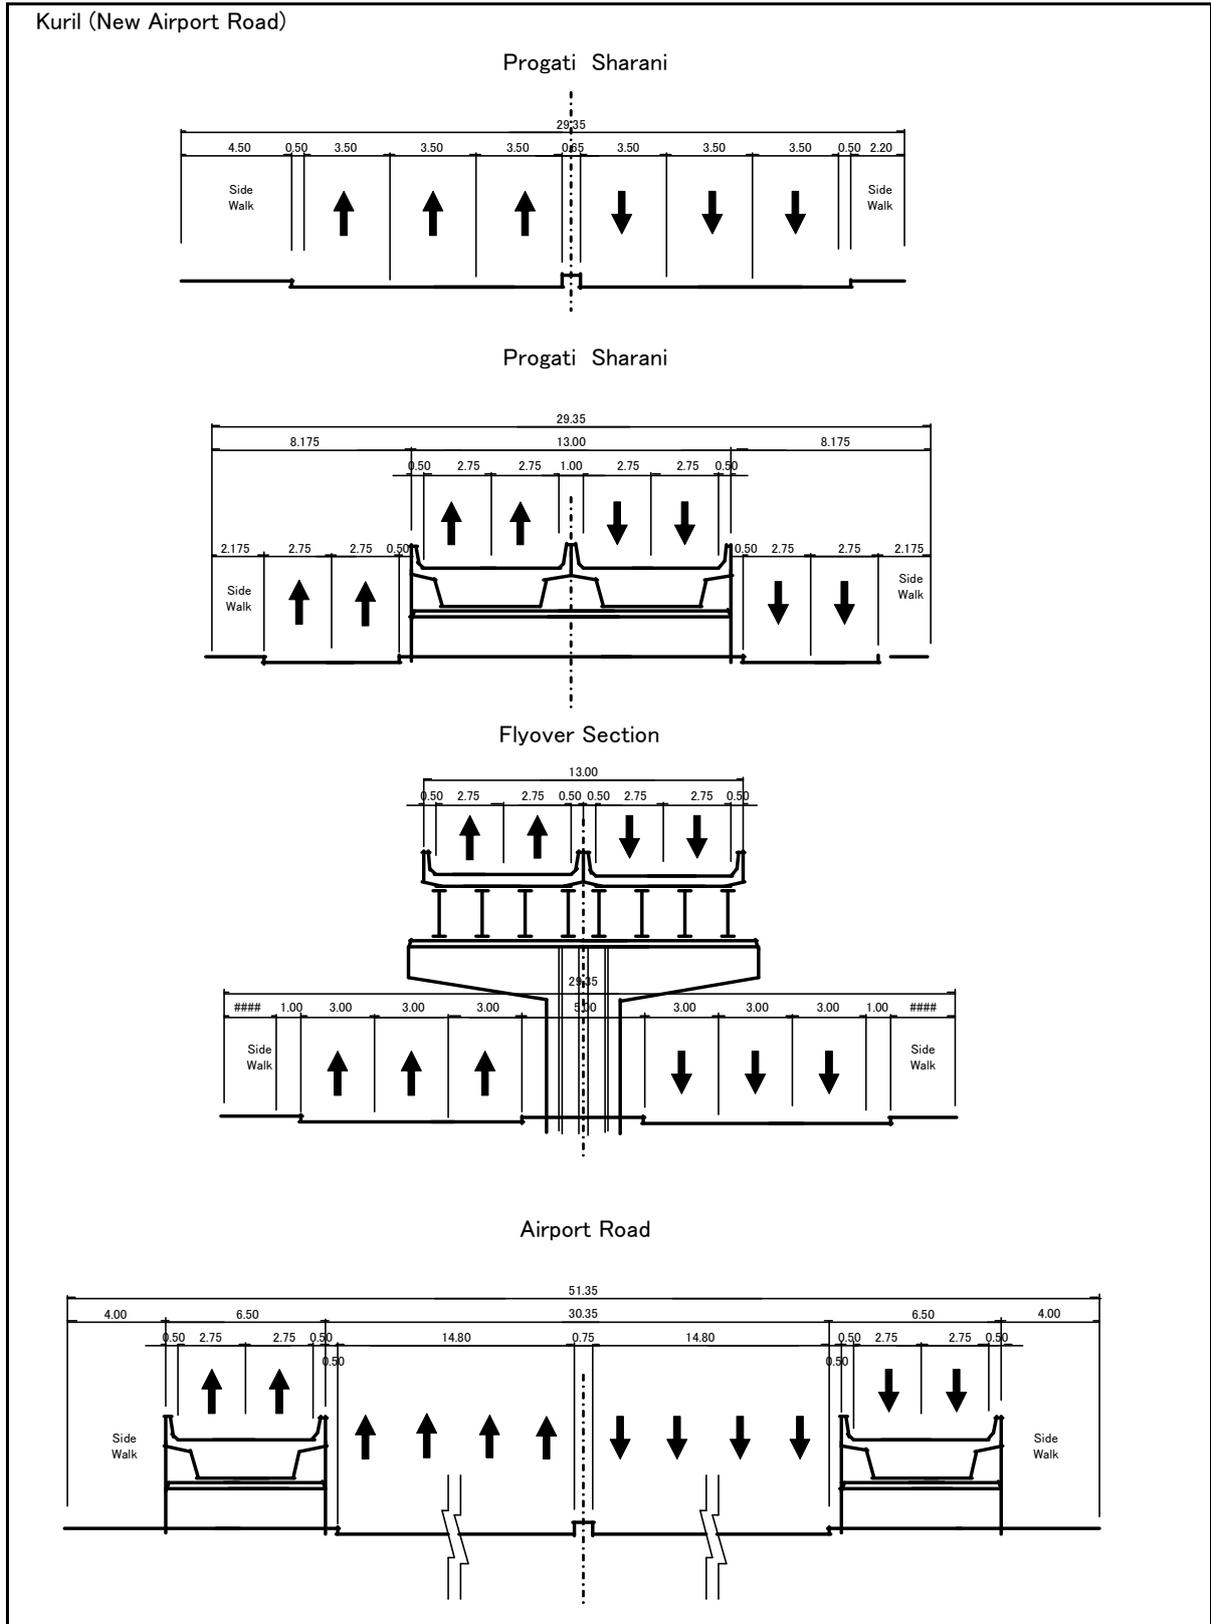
Typical Cross Section of Kuril Flyover Plan
